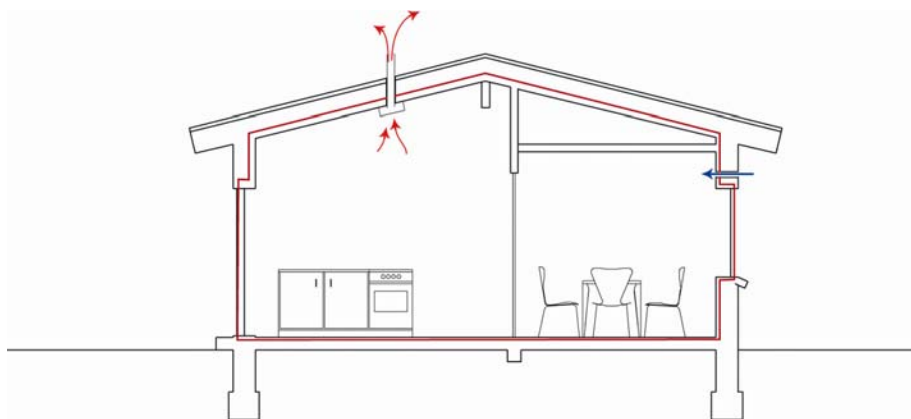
Location of the airtight shell in a building. The shell follows the building envelope, which consists of lightweight or heavy weight building components like wood-stud walls and concrete wall elements, respectively, combined with windows, doors, ceiling, roof and floor-slab constructions.
